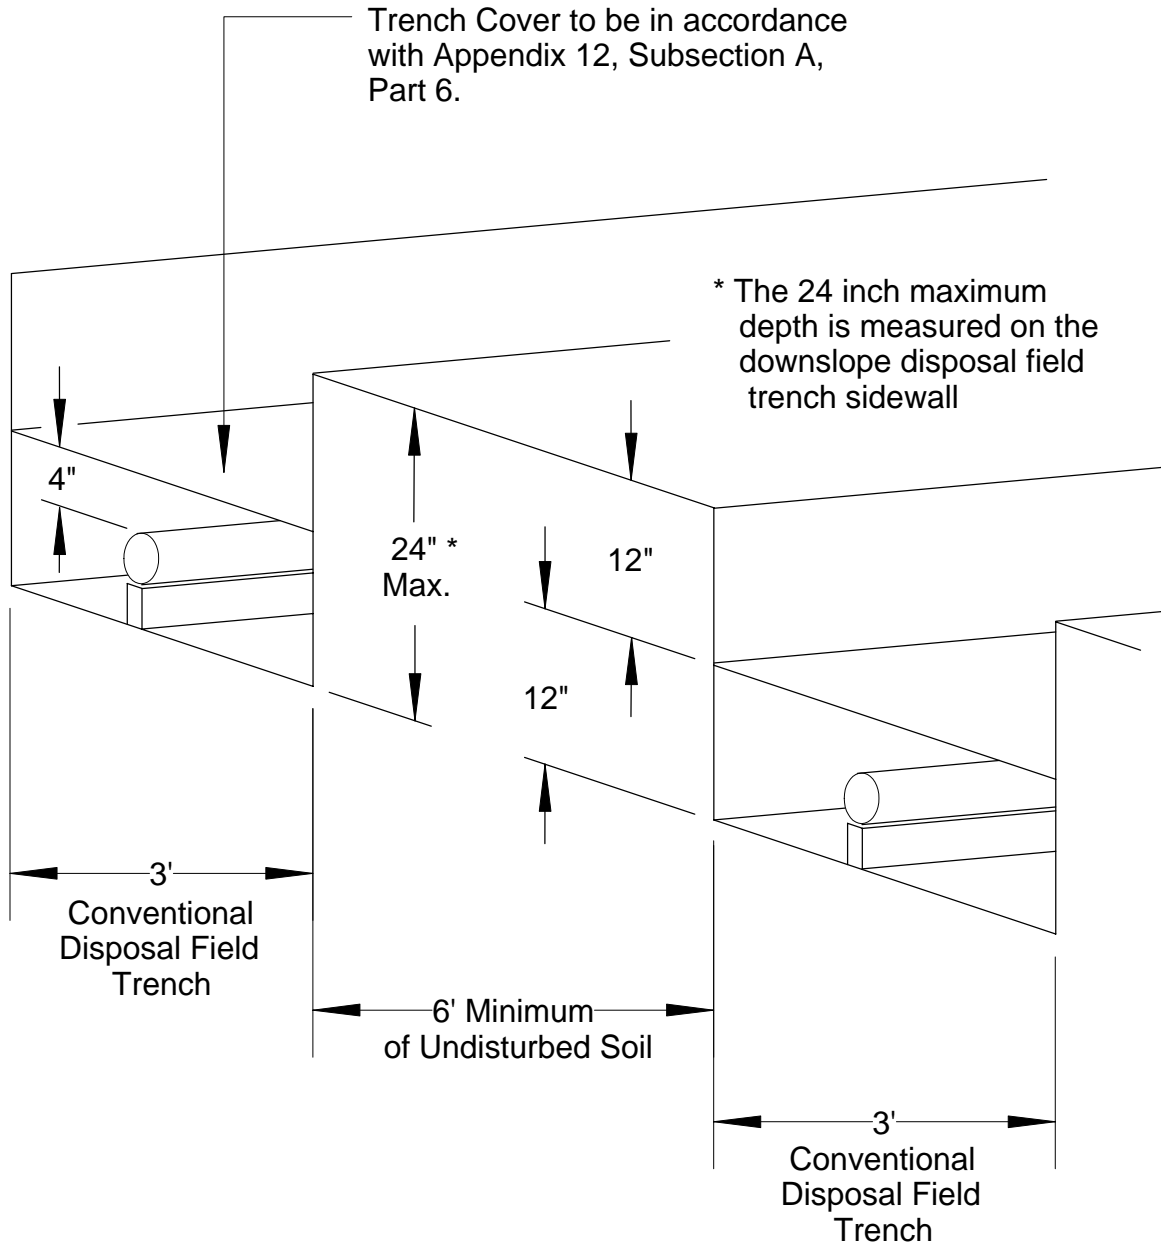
Cross section diagram of typical conventional system disposal field trench arrangement.
